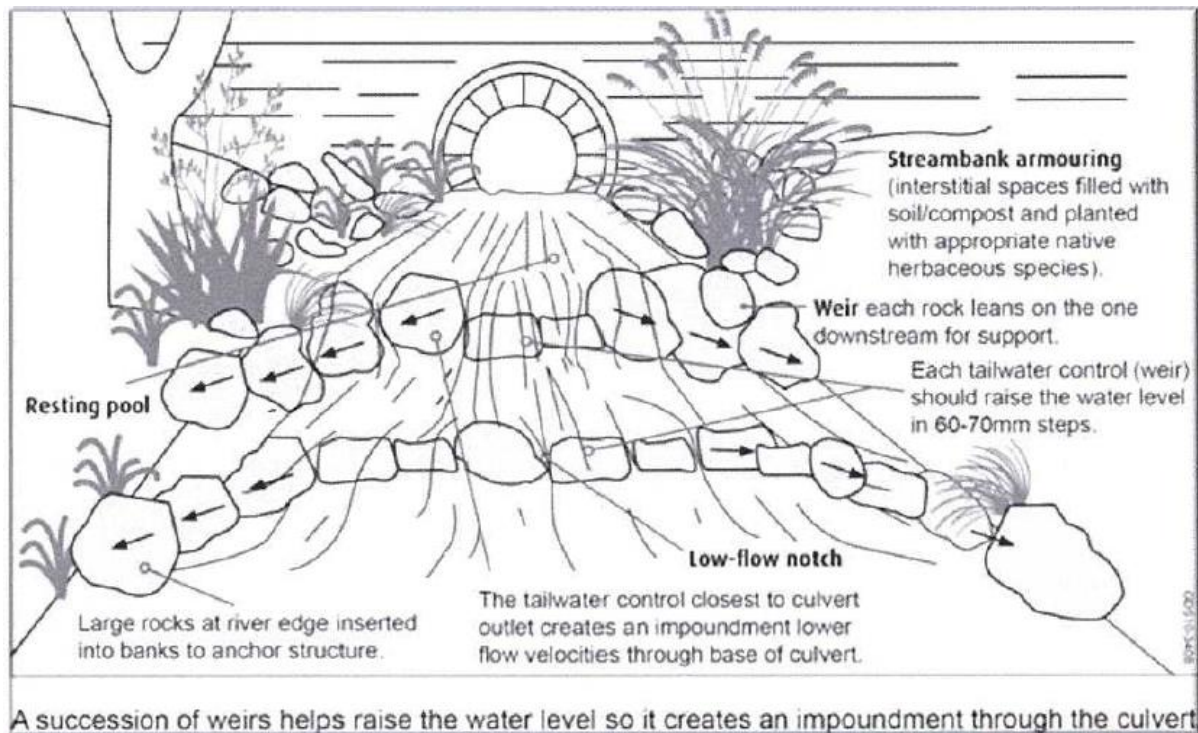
example of rock weir to reduce culvert outlet erosion (Culvert remediation - case studies, 2013)
